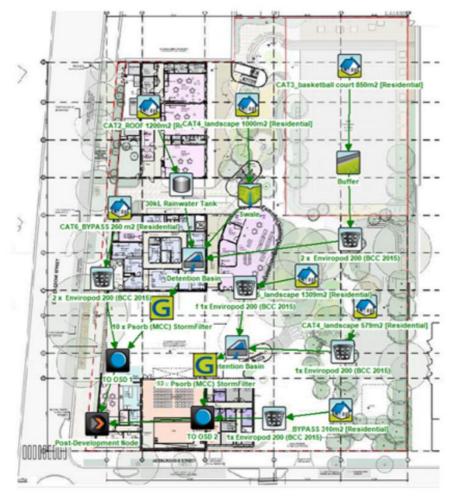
MUSIC Modelling Layout (Background on Architectural Plan Issued 01.05.2020)
